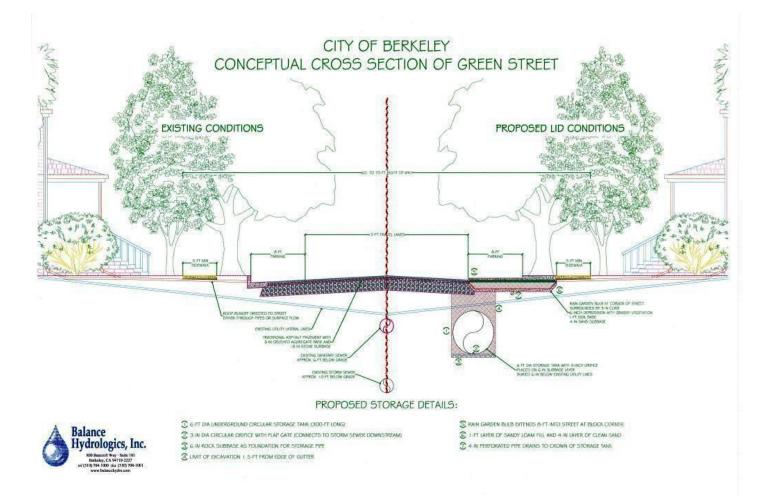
, Conceptual Cross Section of Typical Green Infrastructure
